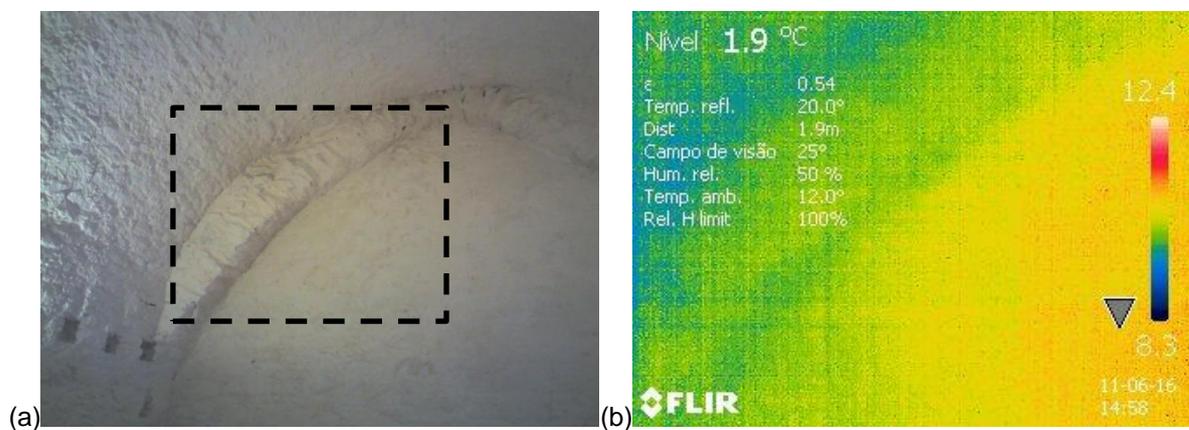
Moisture on first floor where barrel arched ceiling meets gable walls
